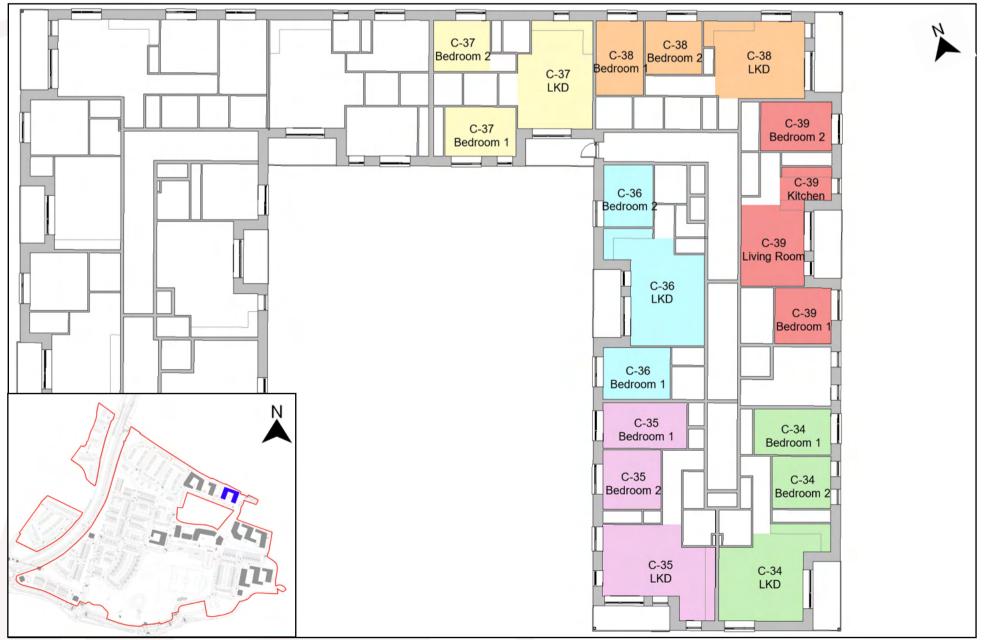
Floor plan of assessed building & Keyplan highlighting the assessed building.
